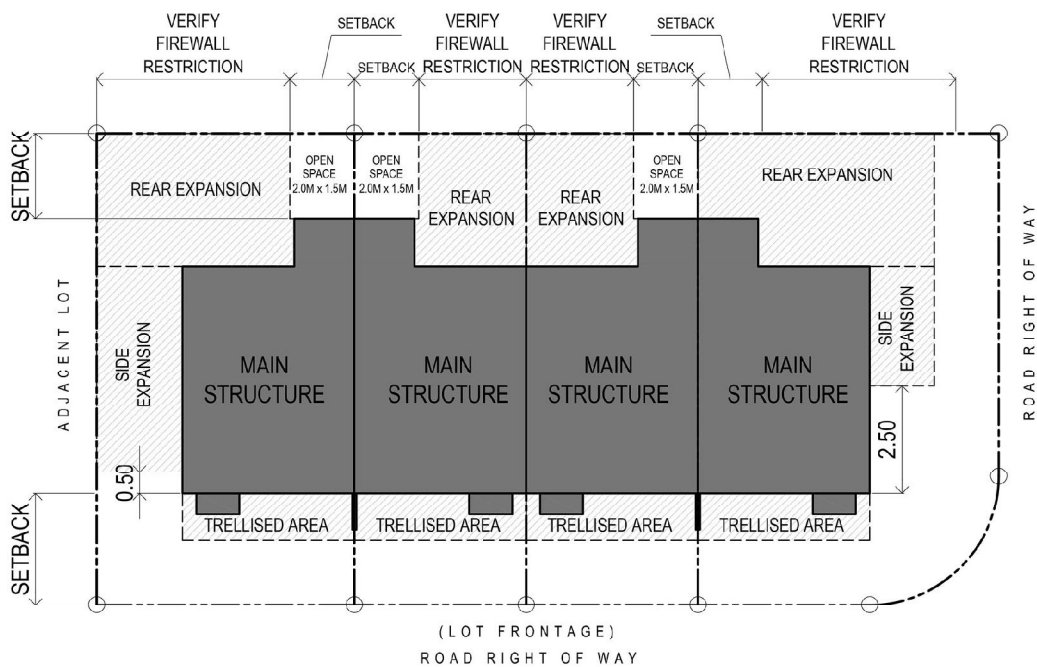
Ground Floor Expansion Area for BP220 Development - Townhouses Houses
